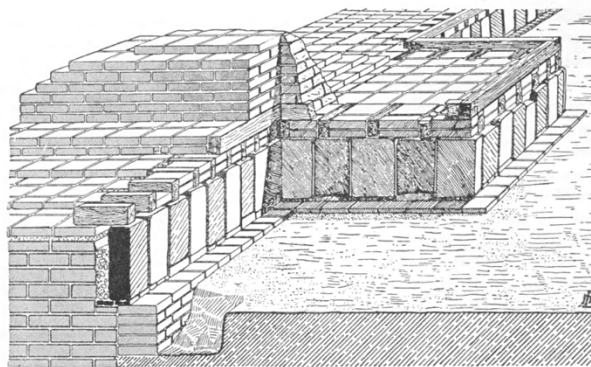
Tell Halaf / Guzana, Palace and Temple Complex in Level II, timber beams over orthostats on the south façade [6]. This timber supporting grill, 50cm in depth, could serve to support the mudbrick walls over them even if the orthostats were pulled out while making efficient use of available wood.
